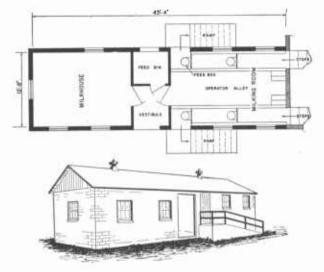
A milking room with two-in-line rows of elevated, walk-through stalls, often ealled chute- or lane-type stalls.
